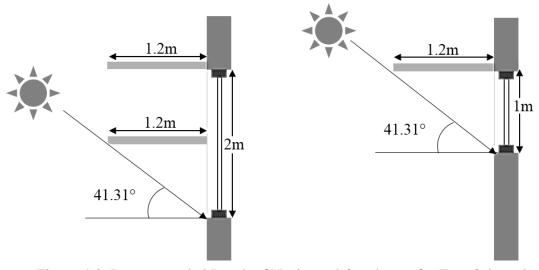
Recommended Depth of Horizontal Overhangs for East Oriented Windows a Section View (by author)
